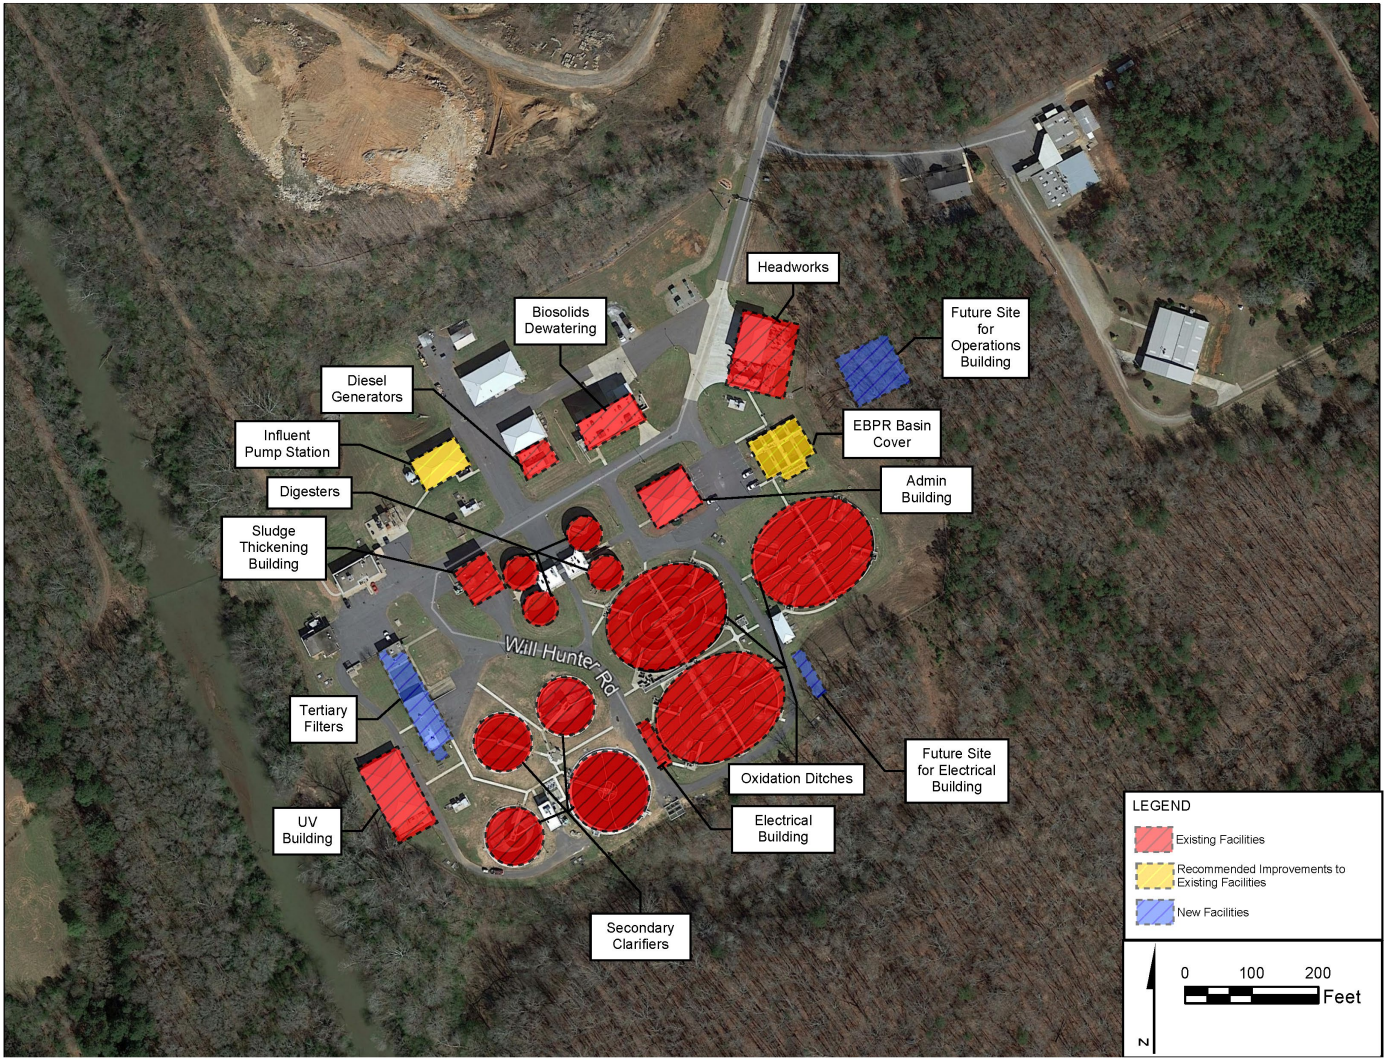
Middle Oconee Water Reclamation Facility Site Plan
